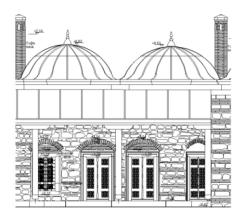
South rooms elevation from courtyard in restitution project by Architecture Foundation, 2010 (archive of DGF)
